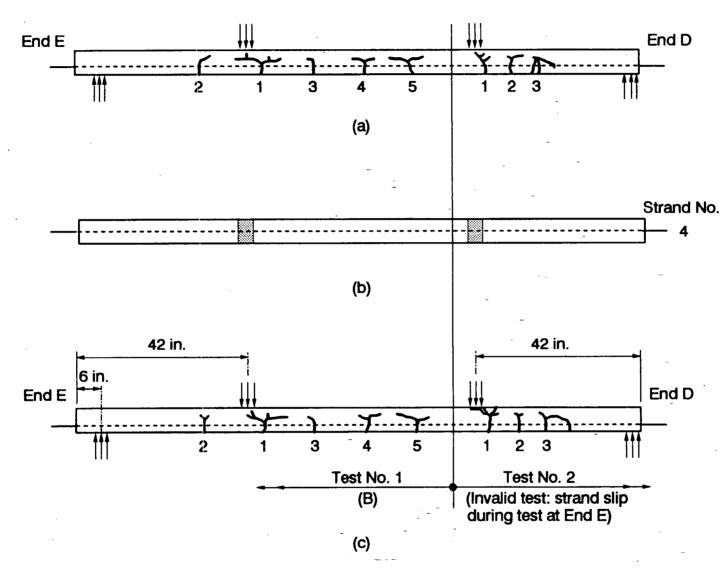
Crack patterns for D-type Specimen No. 10-6.0DU-12: (a) mirrored side view along Strand No. 4; (b) top view; (c) side view along Strand No. 4
